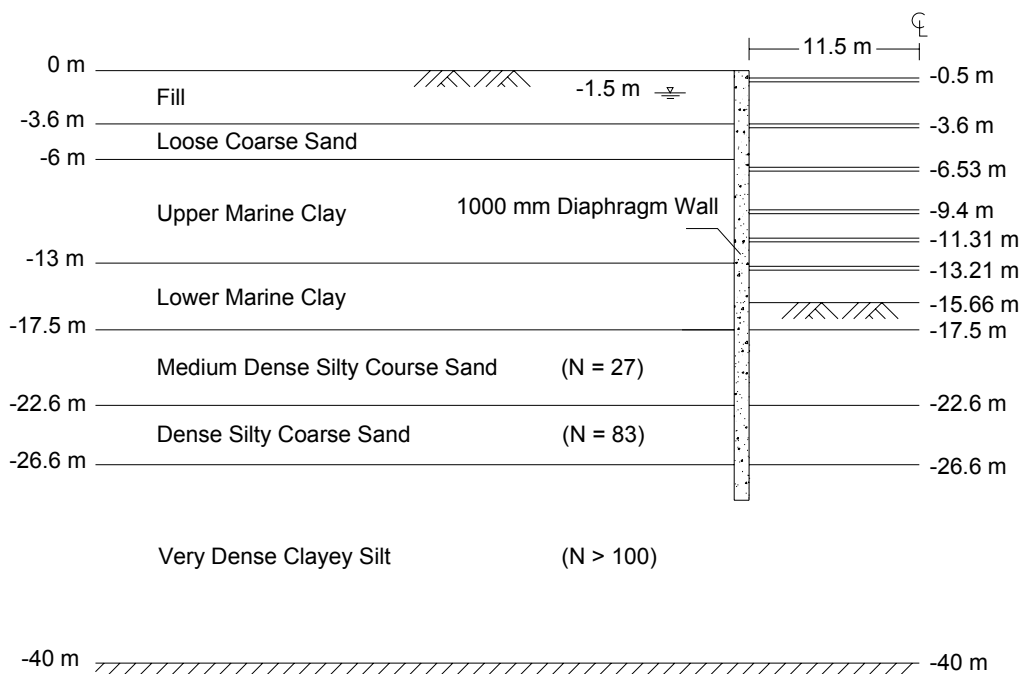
Cross-Section of Excavation at Lavender MRT Station
